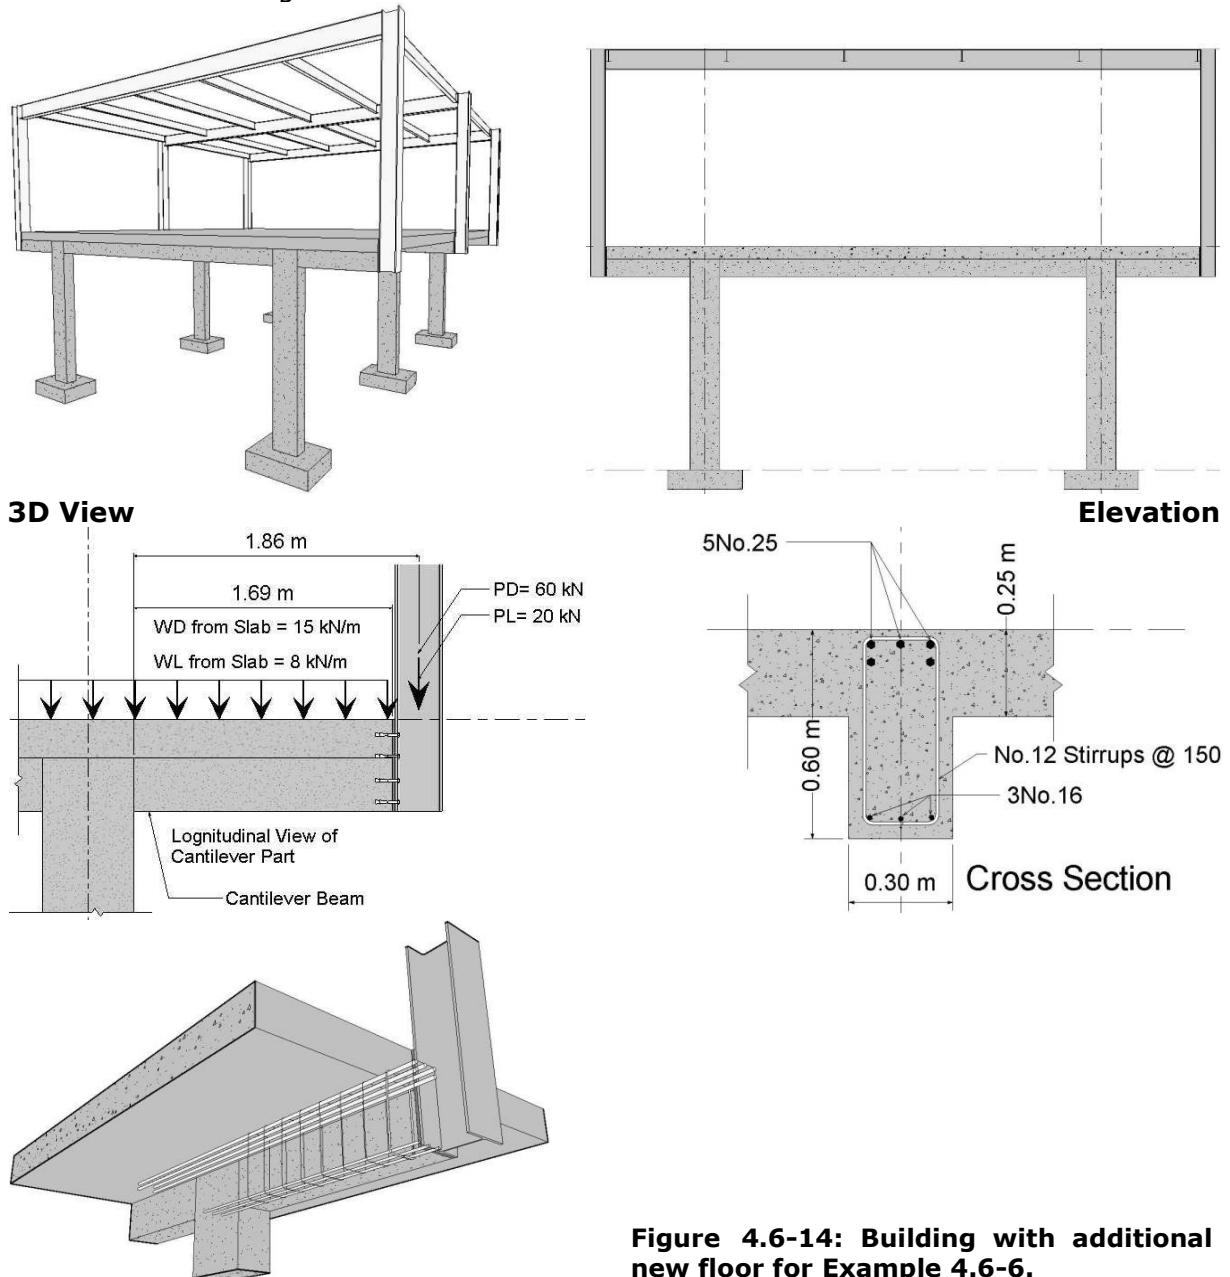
Building with additional new floor for Example 4.6-6.
